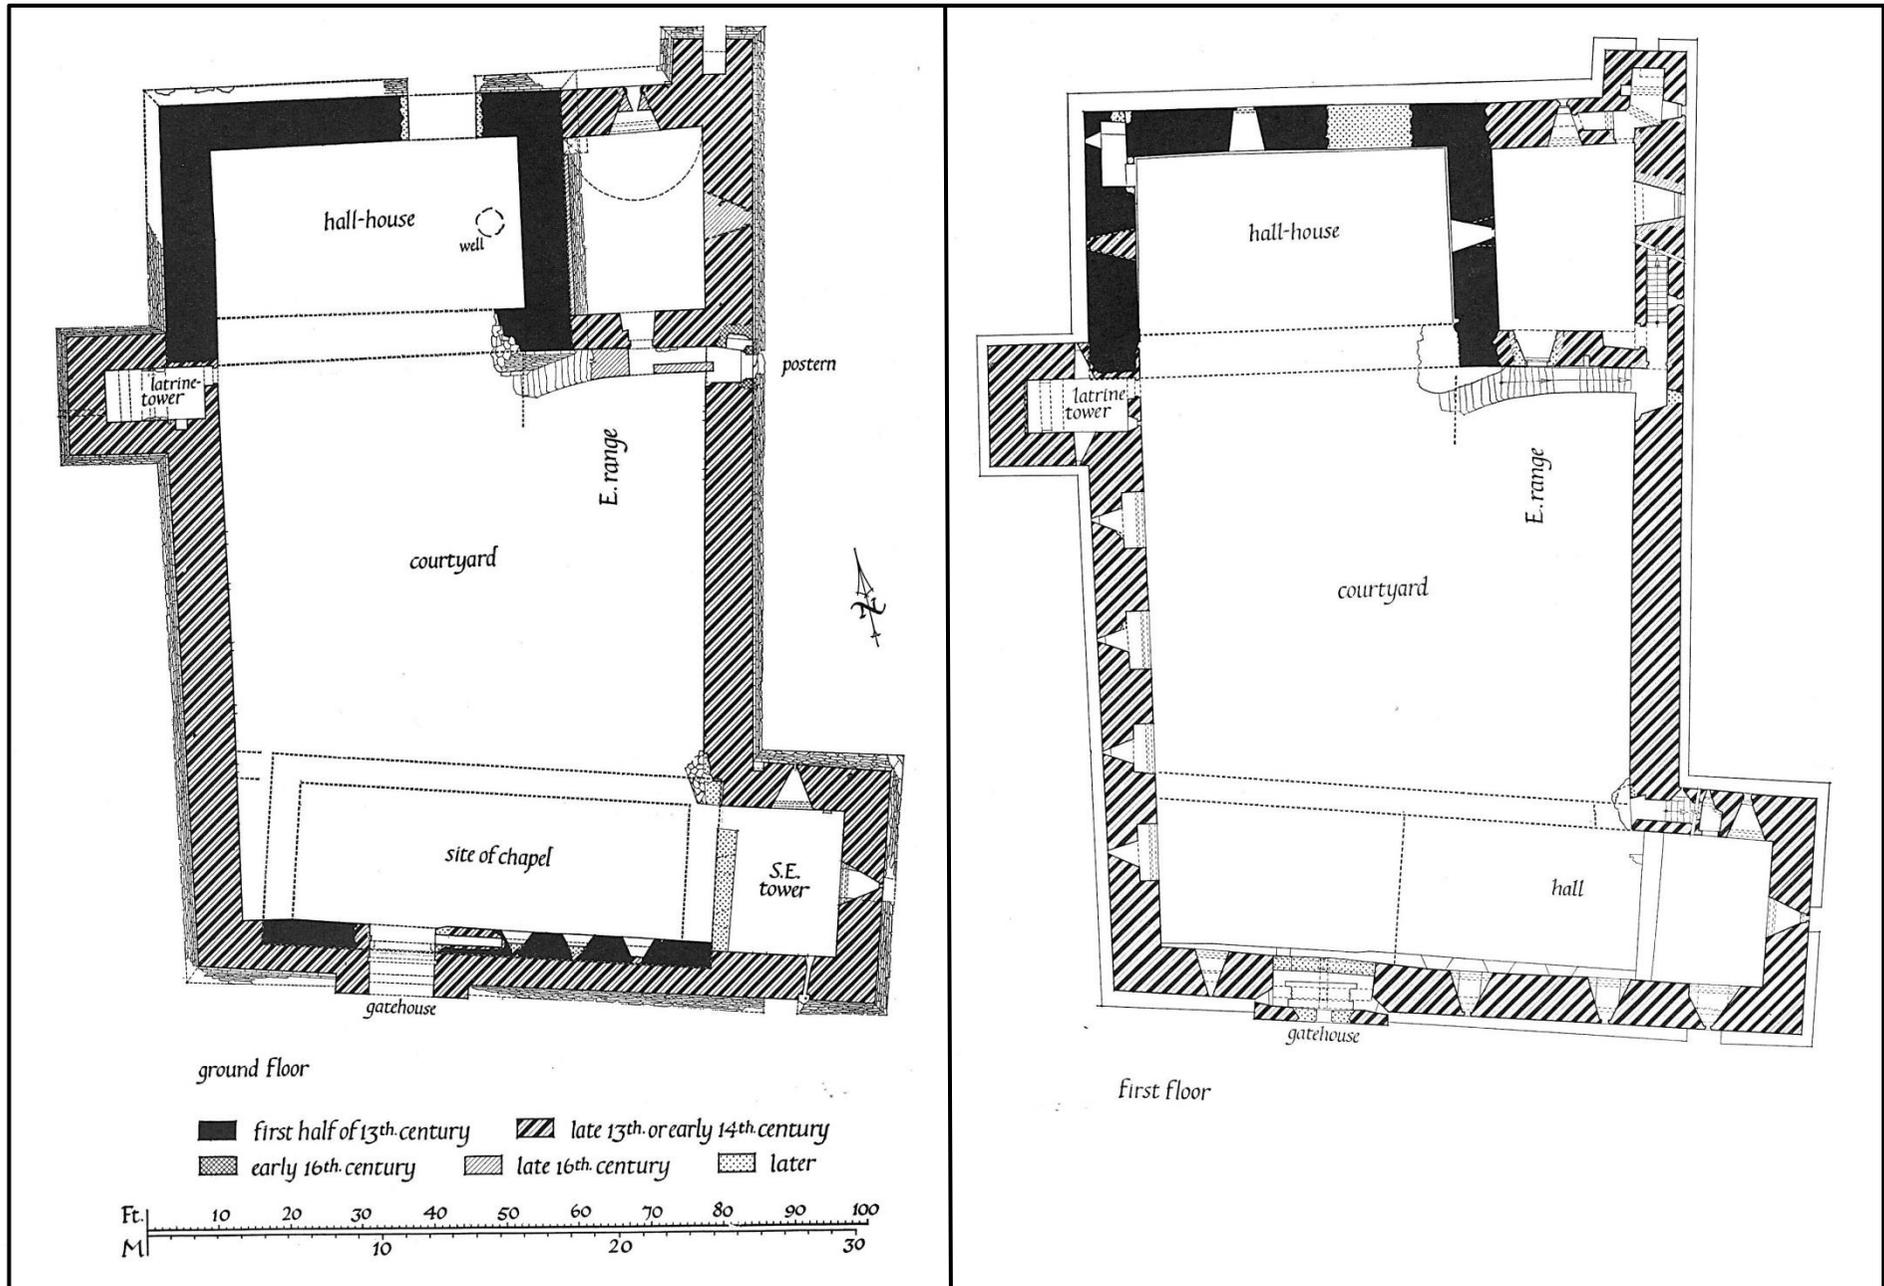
Plans for Skipness Castle with periods of construction and alteration. Source: RCAHMS (1971); pages 166-7.
